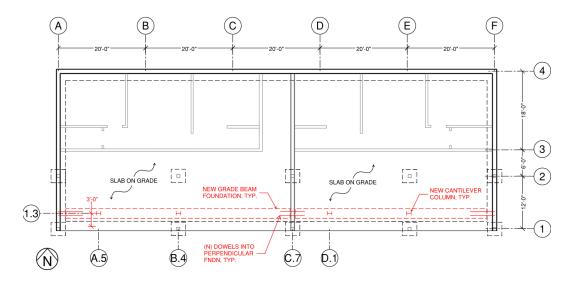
First-story plan showing steel cantilever column and grade beam retrofit location.
